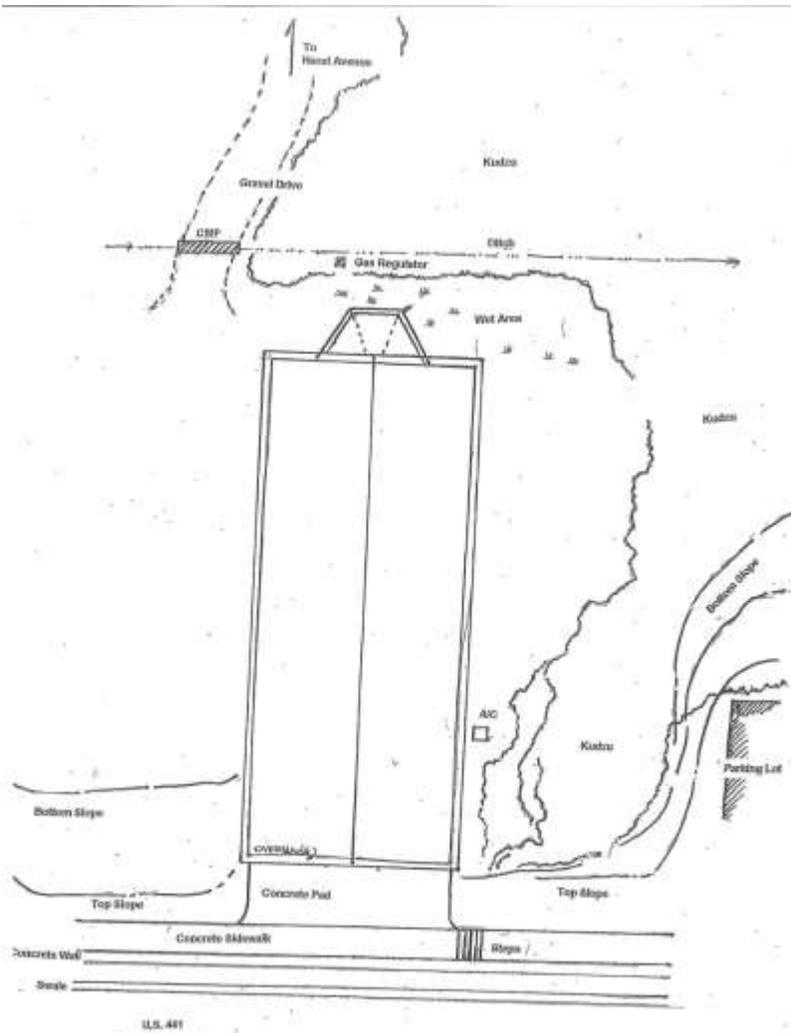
Current road behind the building at North Hazell Ave which continues to a Piedmont College parking lot nearby.
